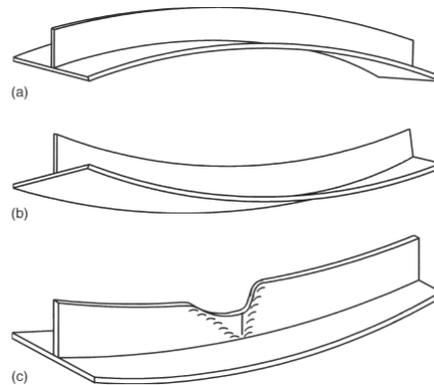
Possible collapse modes of stiffened panels under compressive loads. (a) Plate induced collapse; (b) Stiffener induced collapse, (c) Tripping failure
